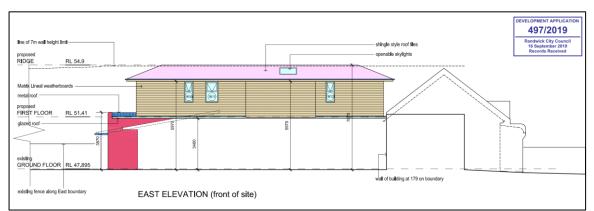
Approved first floor addition to No.177 Darley Road under DA/497/2019 (Source: Joanna Lukaszewicz).
